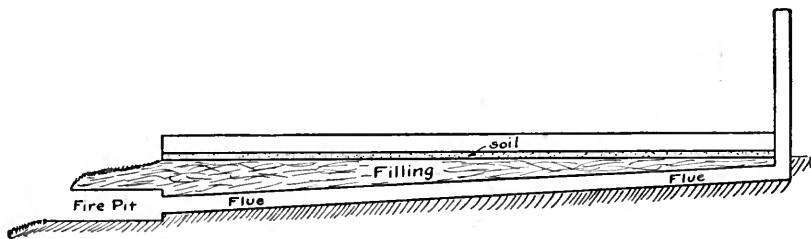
LONGITUDINAL SECTION OF FIRE HOTBED.
